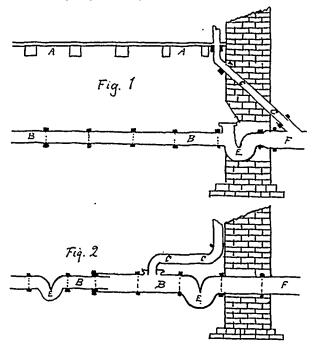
Plumbing arranged in a satisfactory manner. Fig. 2—Plumbing as actually installed. A A—Factory floor. B B—Tile drain below floor. C C—Soil pipe. E E—Traps. F F—Street drain.
